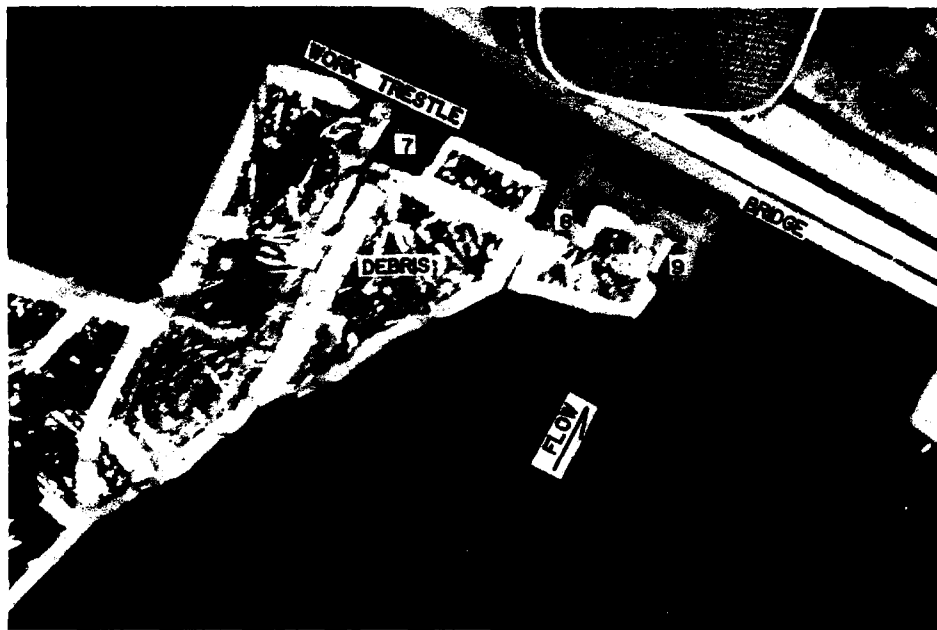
The model for Test 2 on 22 March 1979. Note that work trestle from cofferdam at pier 9 to pier 10 and cofferdam at pier 10 were removed
